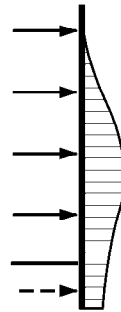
Load model determination for in-situ concrete walls adopting at-rest earth pressure
